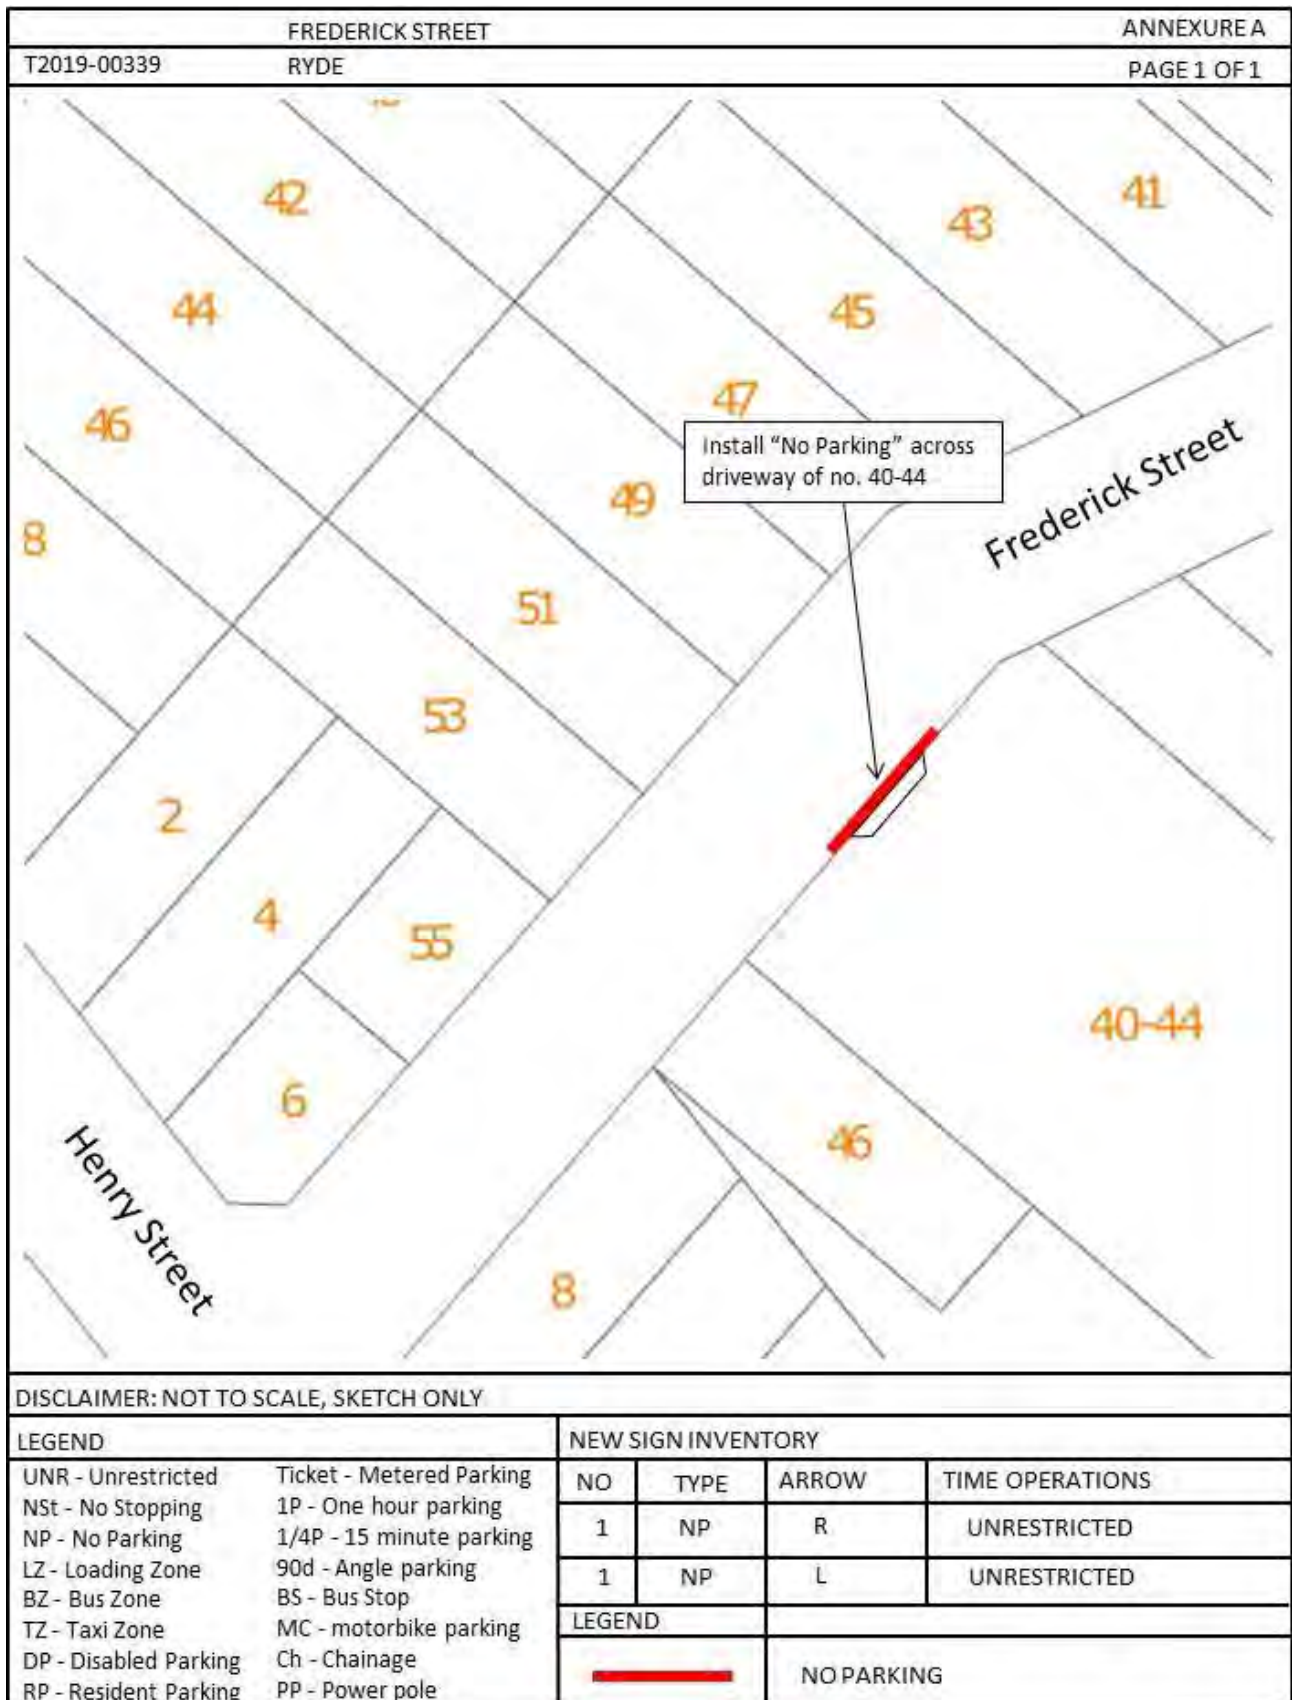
Proposed Parking Changes in Frederick Street, Ryde
